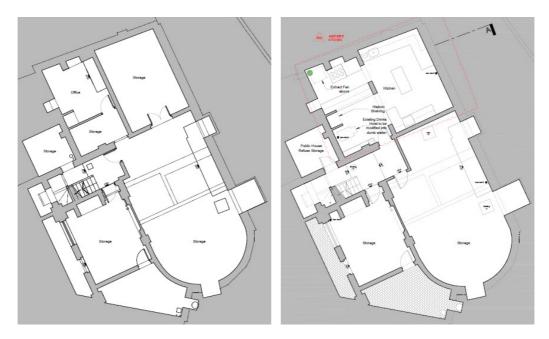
Existing (L) and proposed (R) basement floor plans
